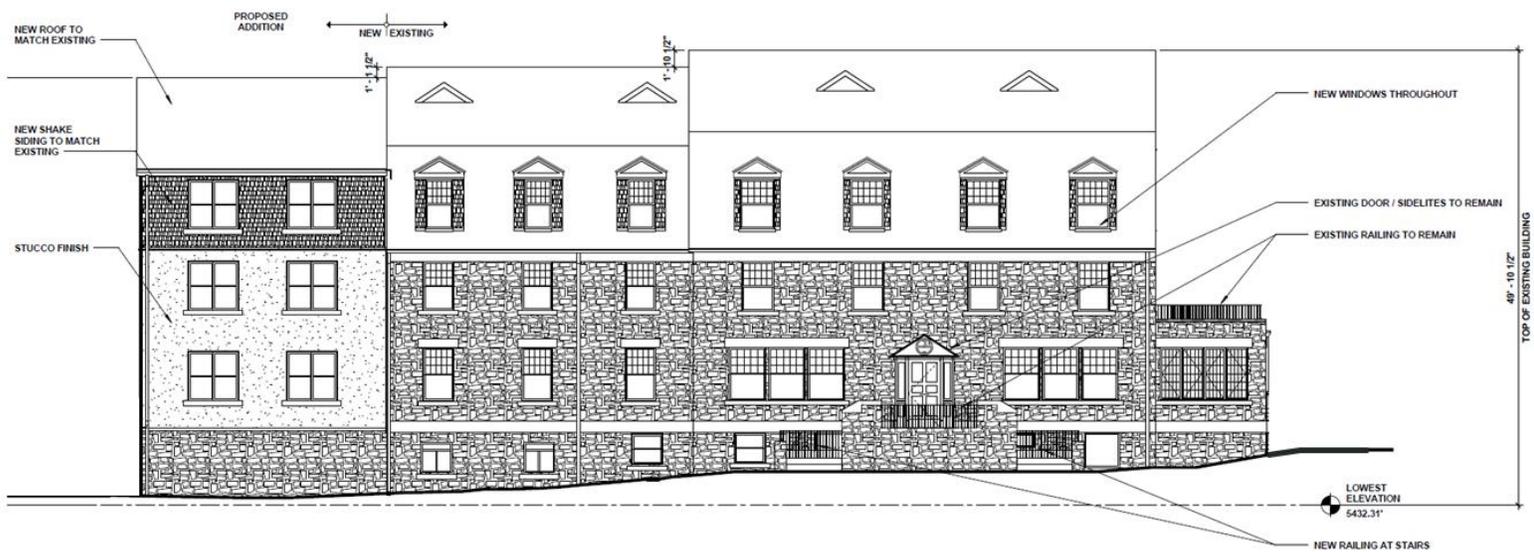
Planned Addition onto Evans Scholar House at 1029 Broadway
